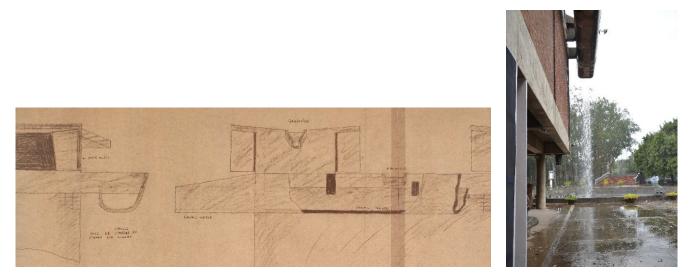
Concrete channel drains runoff from roof into basin, Chandigarh. Source: FLC, DRONAH
